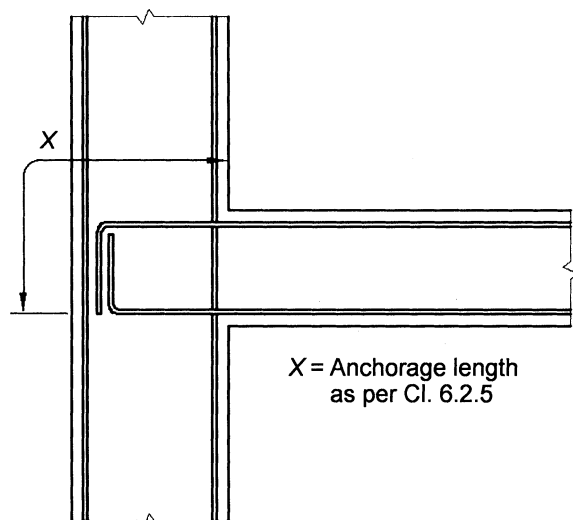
ANCHORAGE OF LONGITUDINAL BEAM BARS AT EXTERIOR BEAM-COLUMN JOINT
